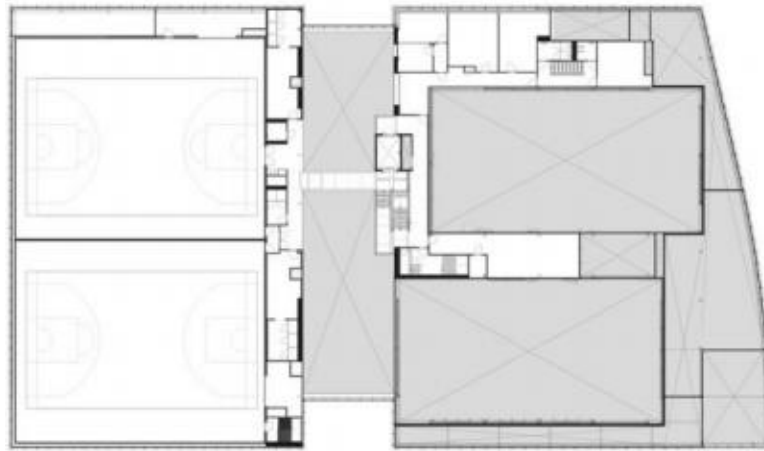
Second Floor plan layout of Erasmus University Sport Hall
